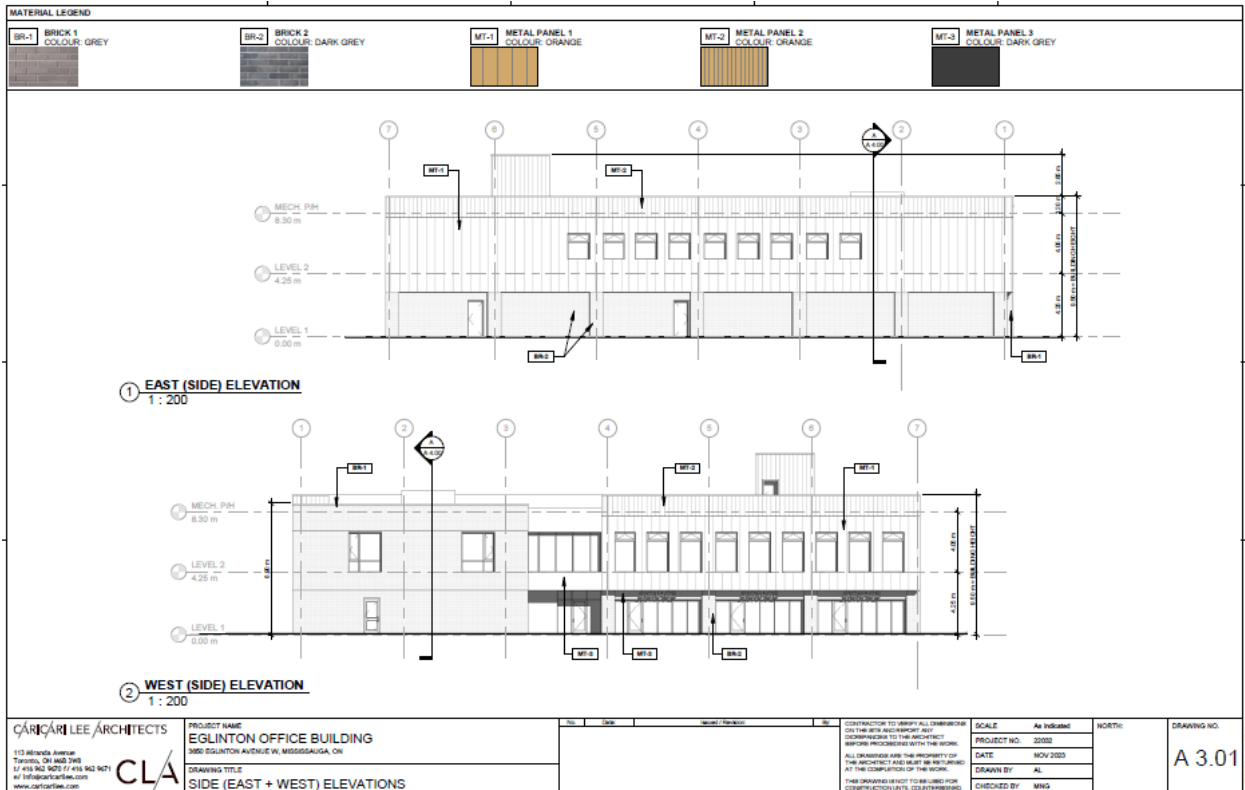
East and West Elevations. (Plan from Owner, November 2023.)
